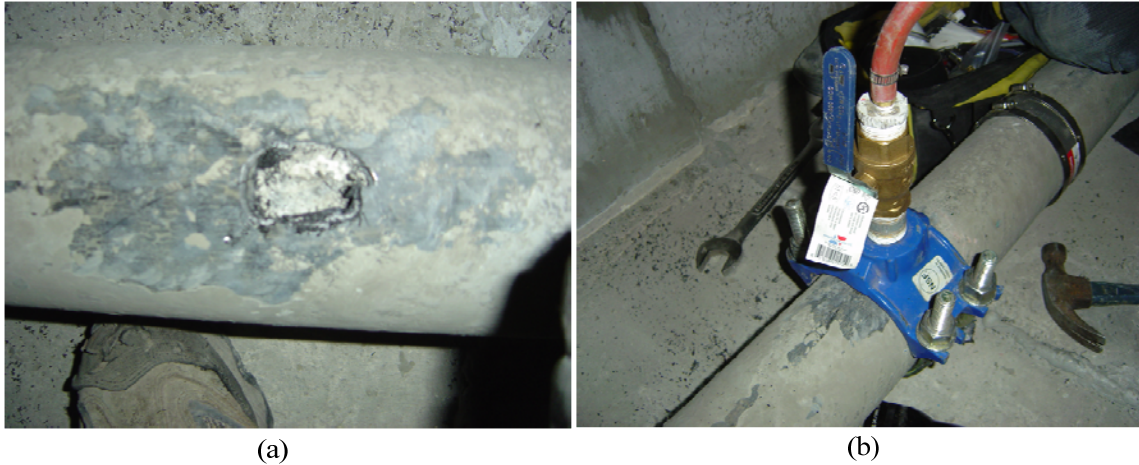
(a) Air Outlet Hole for PVG Method, and (b) Pipe Saddle Tap and Ball Valve for Connecting Vacuum Safety Device and Vacuum Pump.
